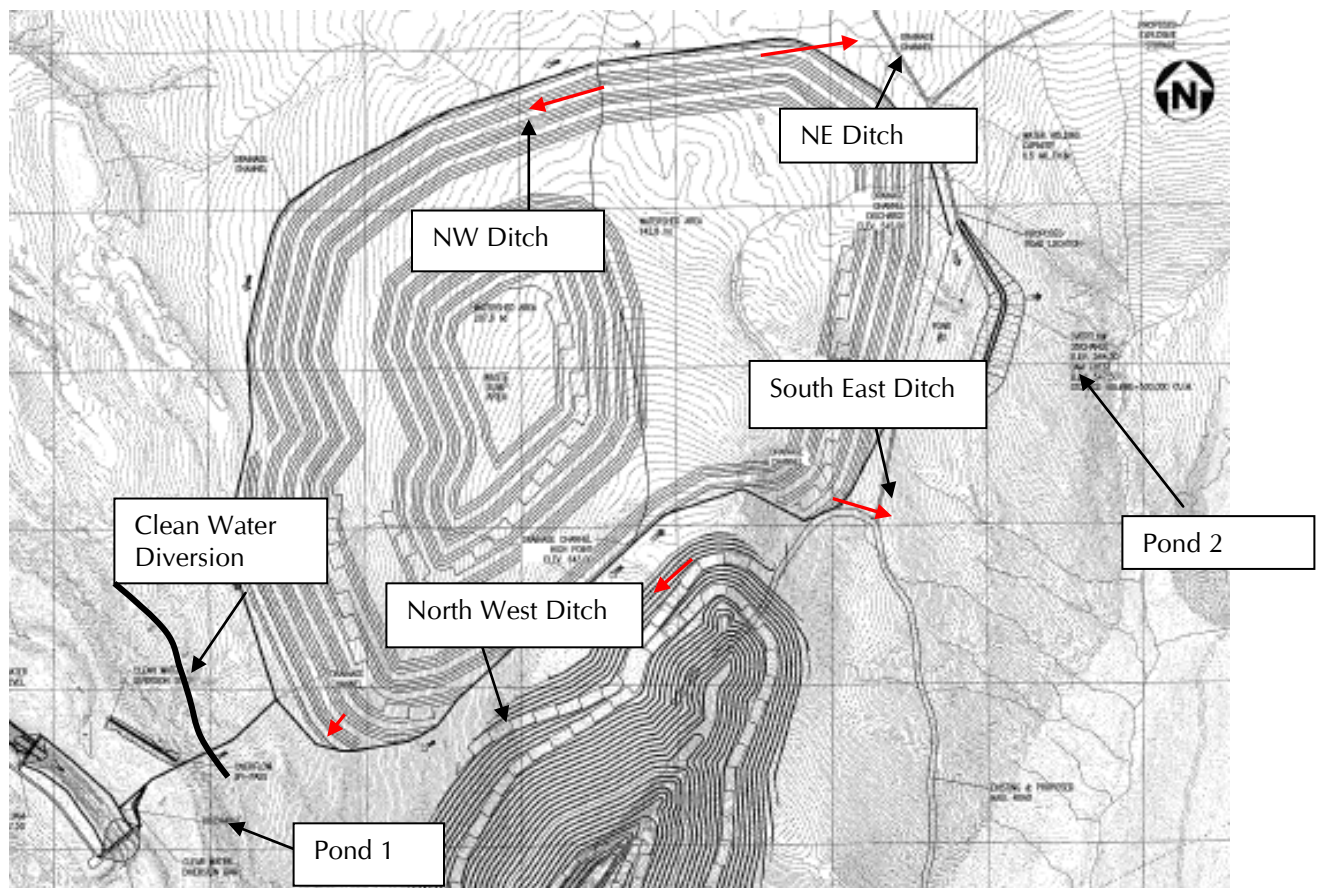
Stormwater Management System Layout - Waste Dump Stockpile Area
